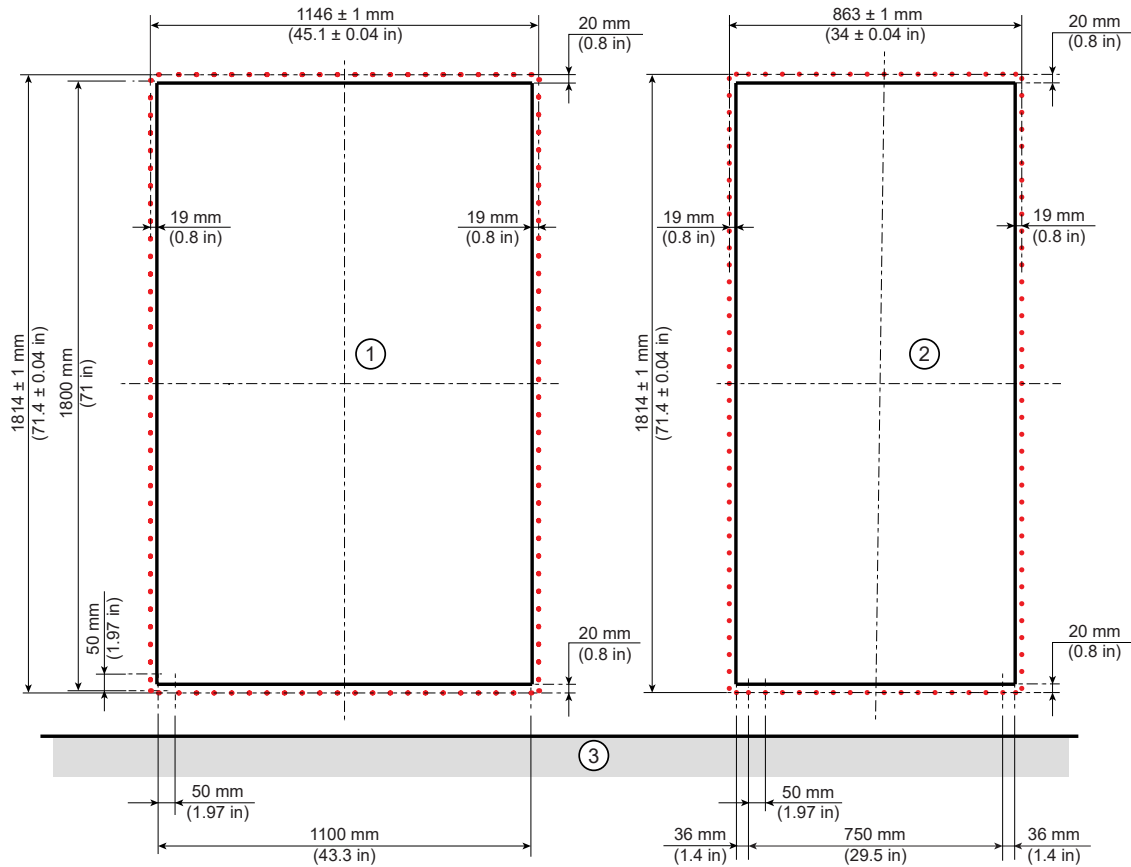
Wall Opening Detail (Equipment Room Side)
